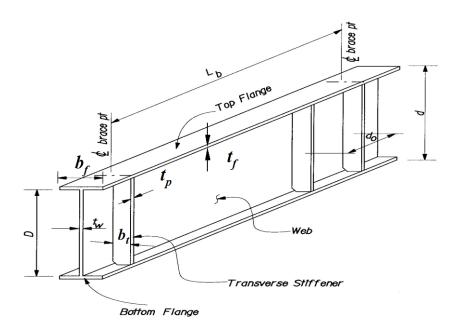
Dimensions of a Typical I-Girder
